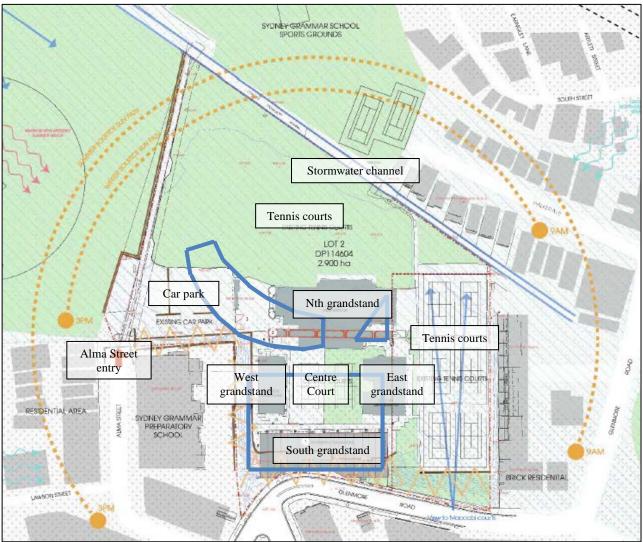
Plan showing existing structures (grey) on the site and the proposed envelopes (blue)
